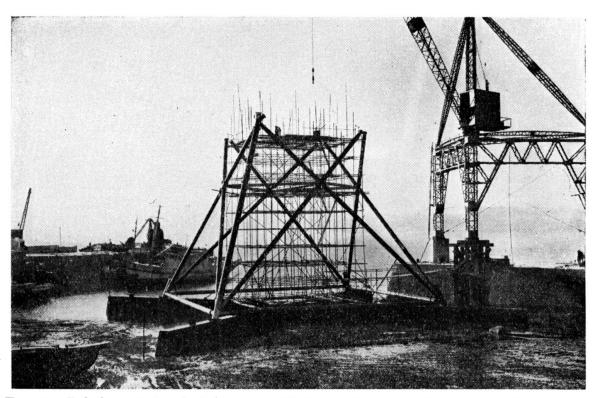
Tubular steelwork being assembled, by 15-ton derrick, on cruciform base girders in St. David's Harbour
